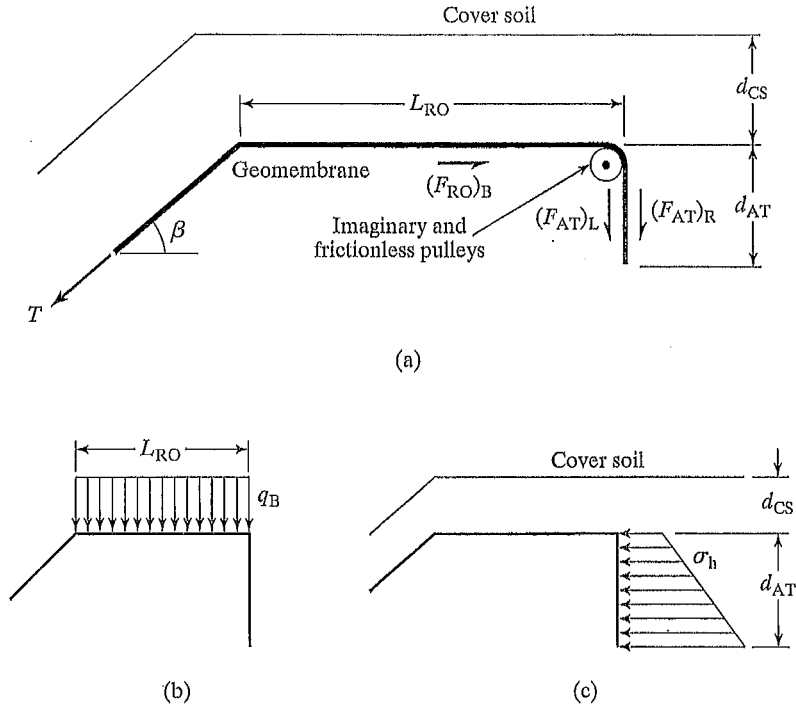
Cross Section of Geomembrane Runout Section with a Rectangular Anchor Trench and Related Stresses and Forces Involved
